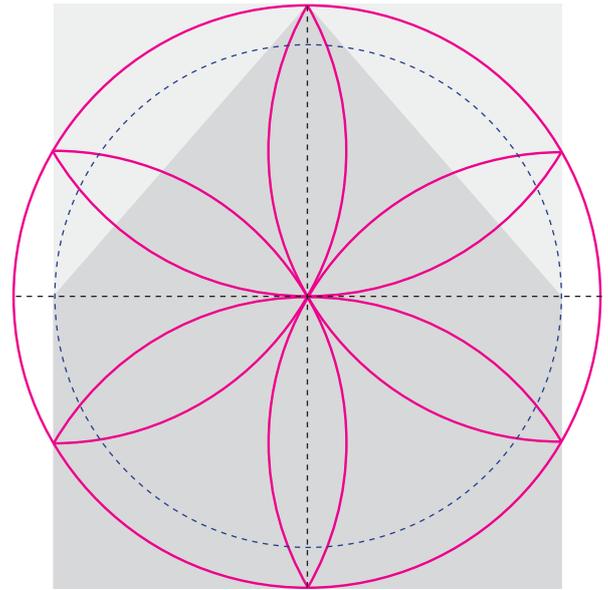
shows a section determined within the inner, parallel circle. Like the section in figure 18, it has its tie beam on the horizontal diameter but has a lower roof pitch and lower side walls.
